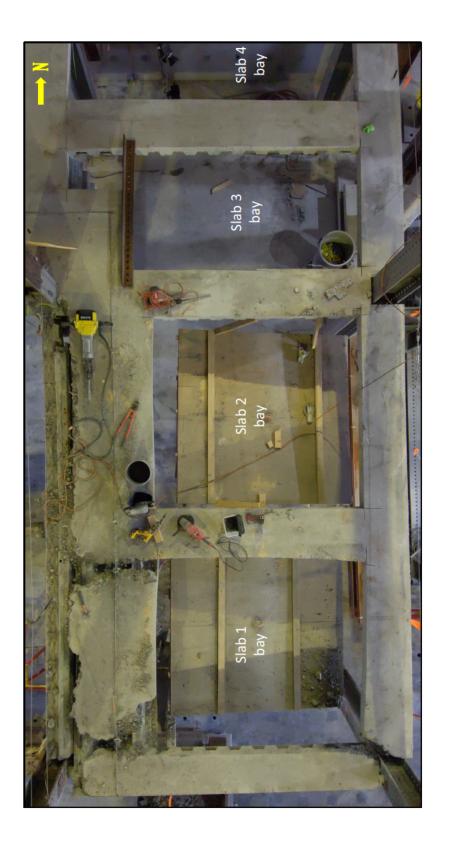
Image of the east side of the surrounding floor showing tripping hazards and object which could fall from the surrounding floor to the strong floor near unguarded edges.
